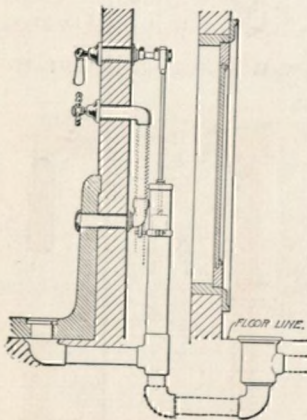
A—"Pallas" supply and waste fittings with trap below floor. Trap is provided with clean-out which may be in adjoining closet as shown.
